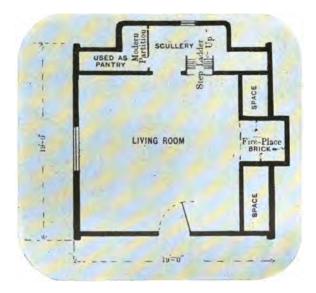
By elevating the roof and making perpendicular side walls, the waste spaces, etc., were utilized and more room gained.
